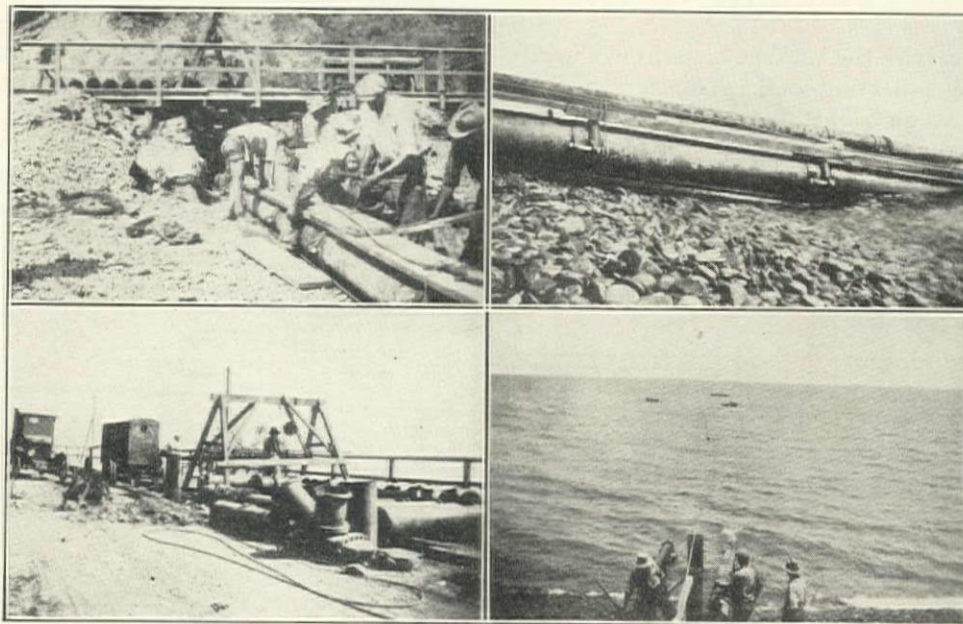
(UPPER LEFT) WIRING PLANKS TO TOP OF 12-IN. UNIVERSAL CAST-IRON OCEAN OUTFALL SEWER FOR CITY OF AVALON. (UPPER RIGHT) DETAILS OF NEW OCEAN OUTFALL SEWER, OLD LINE IN BACKGROUND. (LOWER LEFT) LOWERING HOIST, SHOWING WINCH, AND ONE COMPRESSOR; 12-IN. GATE VALVE IN FOREGROUND. (LOWER RIGHT) LETTING AIR OUT AFTER LAST 30 FT. OF OUTFALL HAD BEEN PULLED OUT
